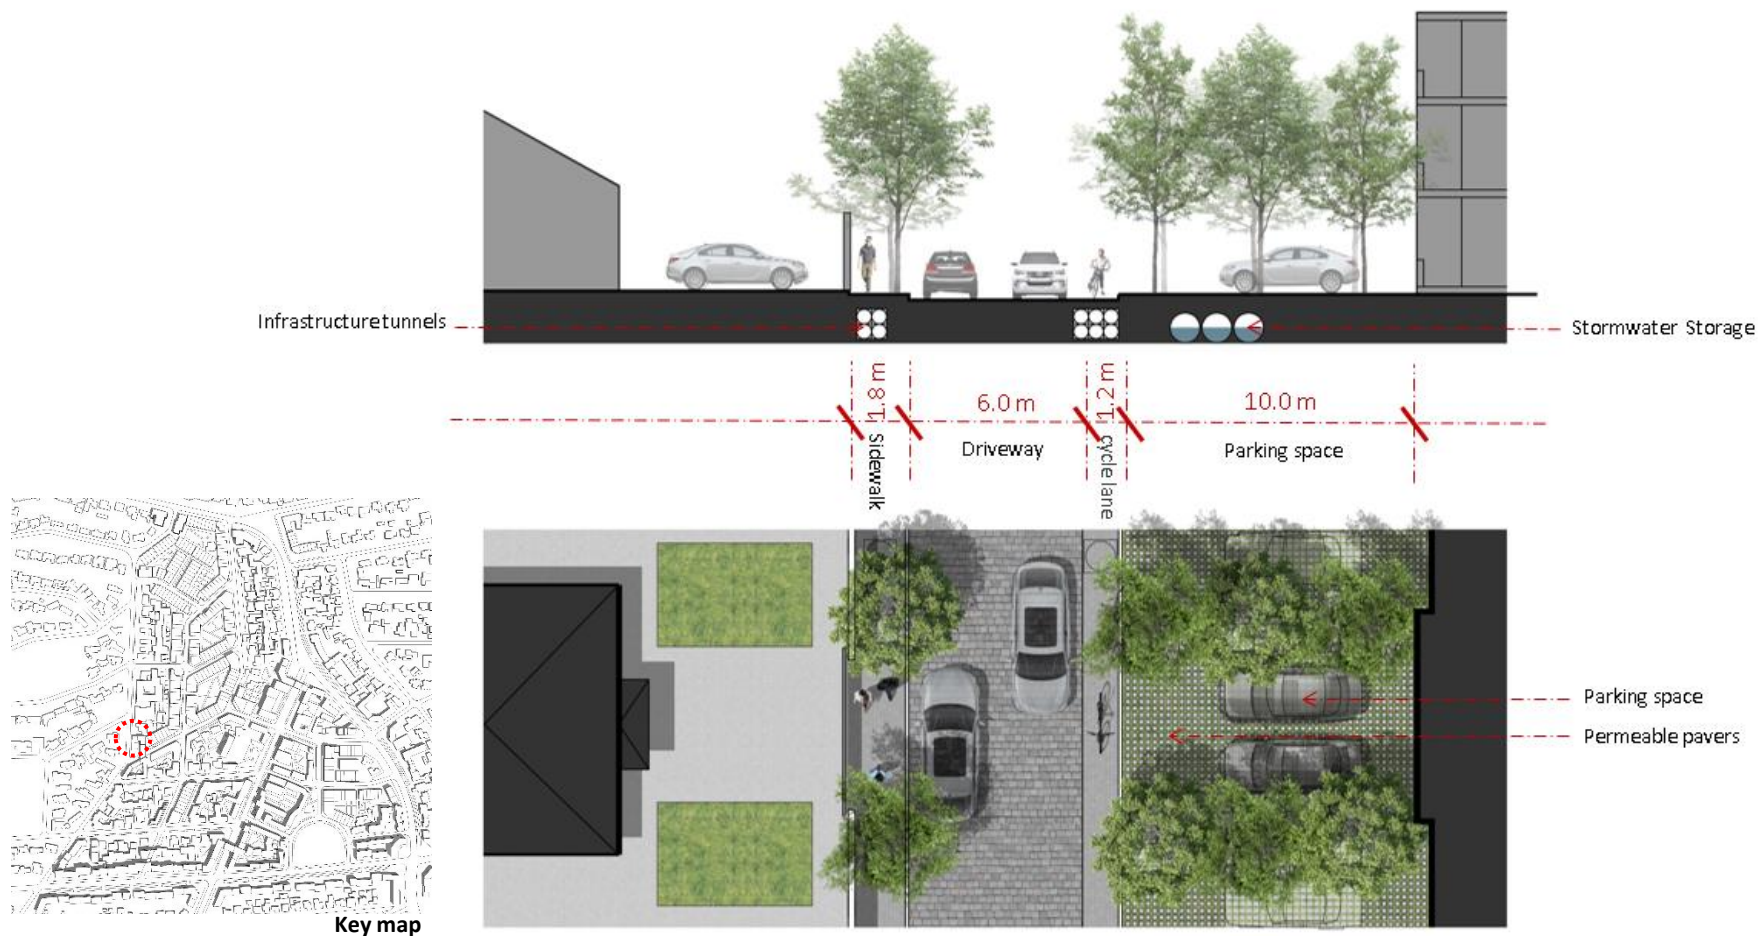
Cross section through the existing residential area and proposed new residential area. The road is two-way and does not allow on-street parking. On the new development, space is allowed for cyclists and parking. All road surface materials are permeable and cobbled, which can help slow vehicle speed.
